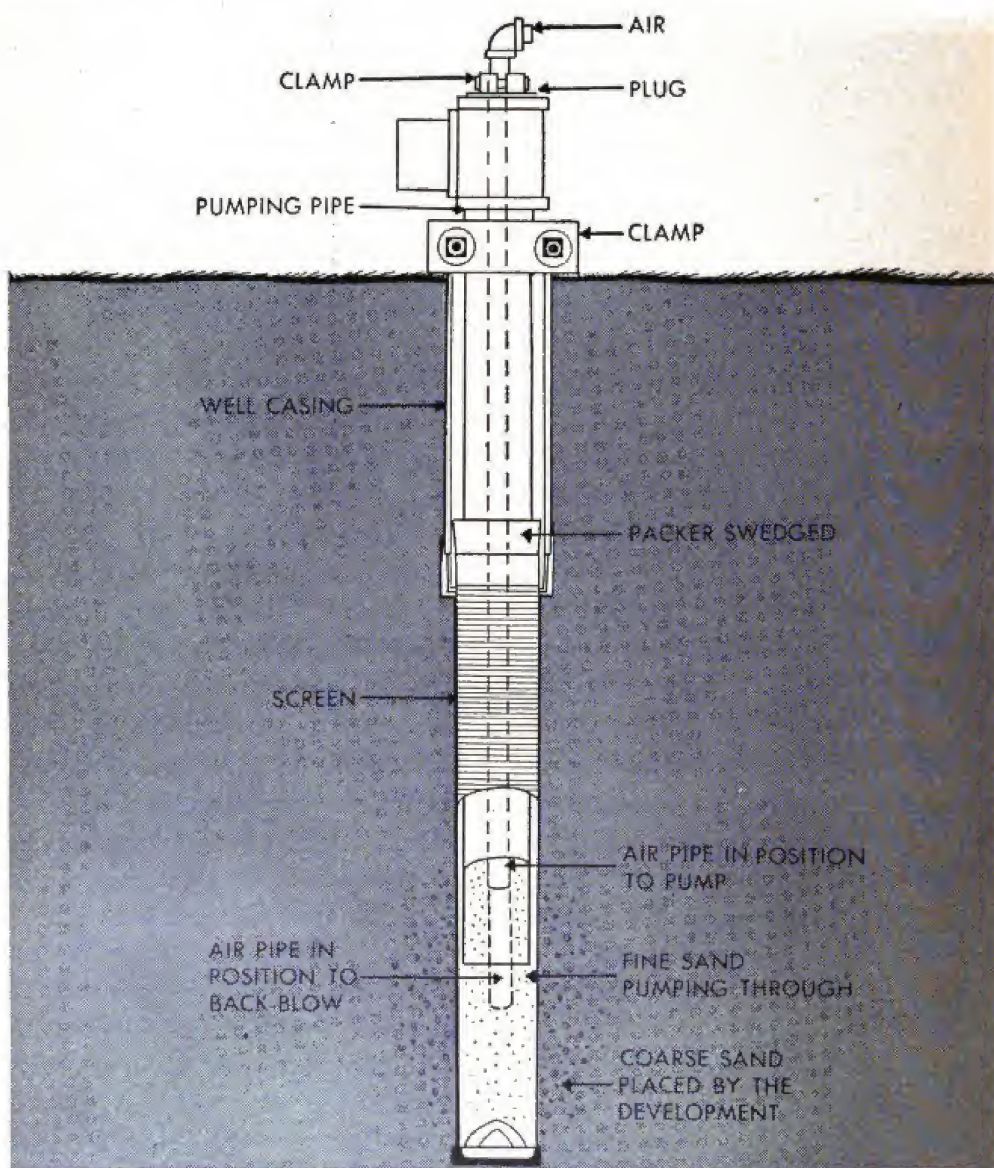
Hook-up for developing well with compressed air by the open-well or surging method, using separate drop pipe.
